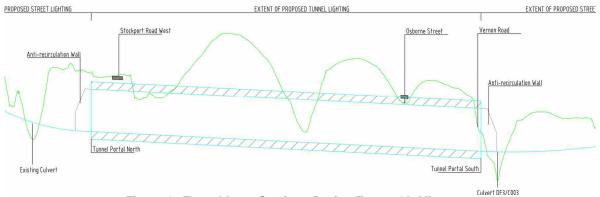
Tunnel Long Section - Design Freeze 4A Alignment
